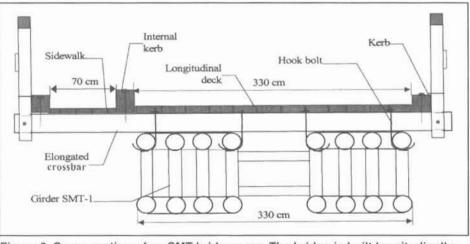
Cross section of an SMT bridge span. The bridge is built longitudinally with a wooden deck on crossbars.
